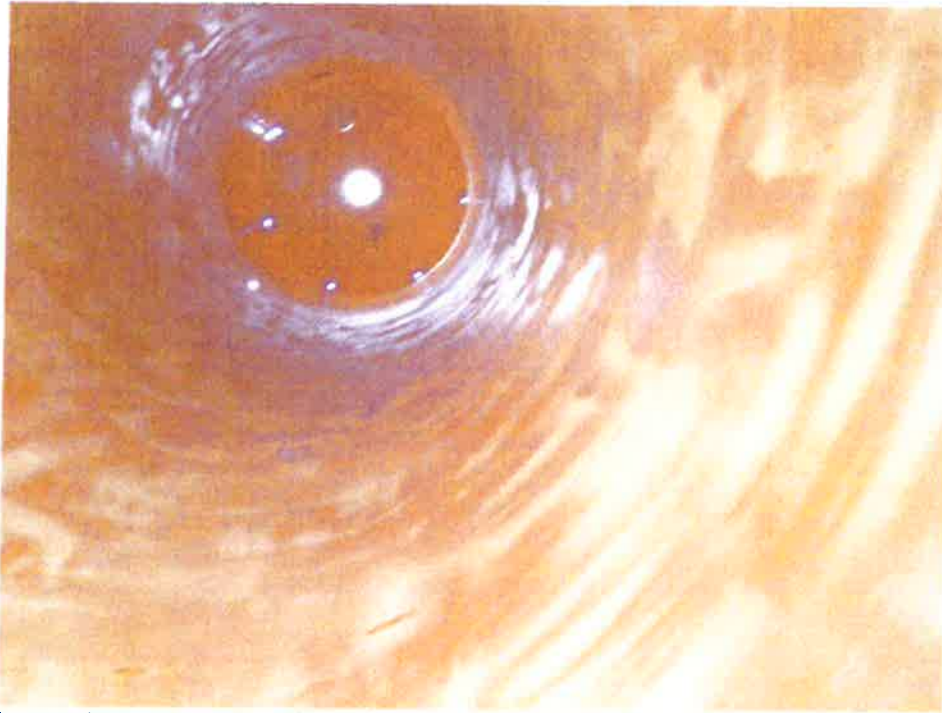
May 5th. All repairs completed on walls and weld seams.
